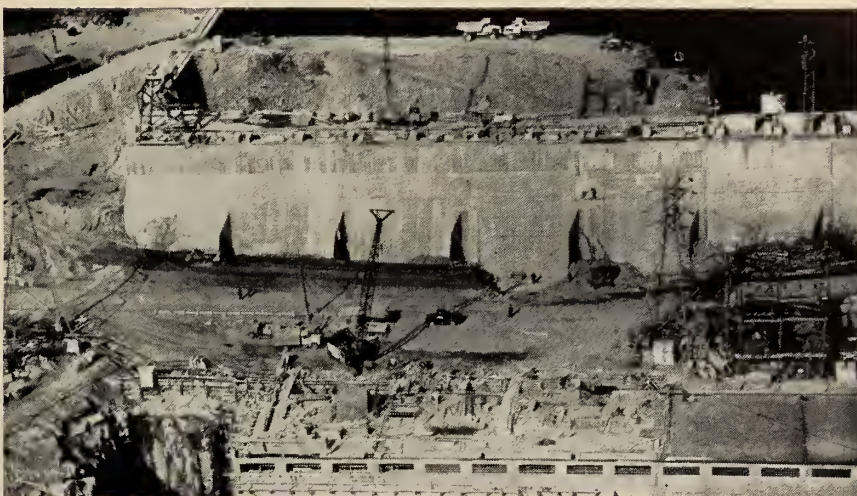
(top). Powerhouse excavation with rock filled timber crib in the background.
